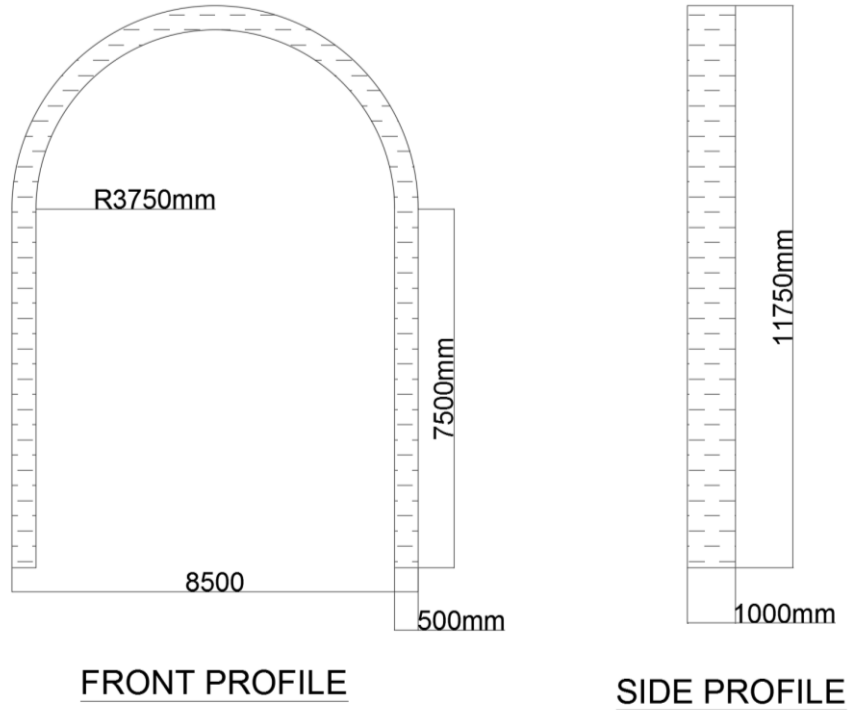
PLAN DRAWINGS OF THE STRUCTURE
